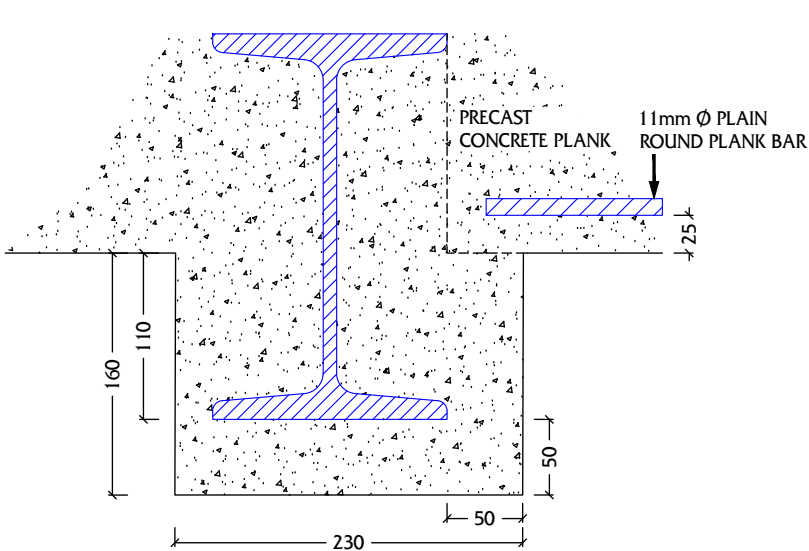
PART SECTION LOOKING WEST THROUGH 1ST FLOOR PRIMARY BEAM - SURVEY AREA Q/10-11 SCALE 1:5
